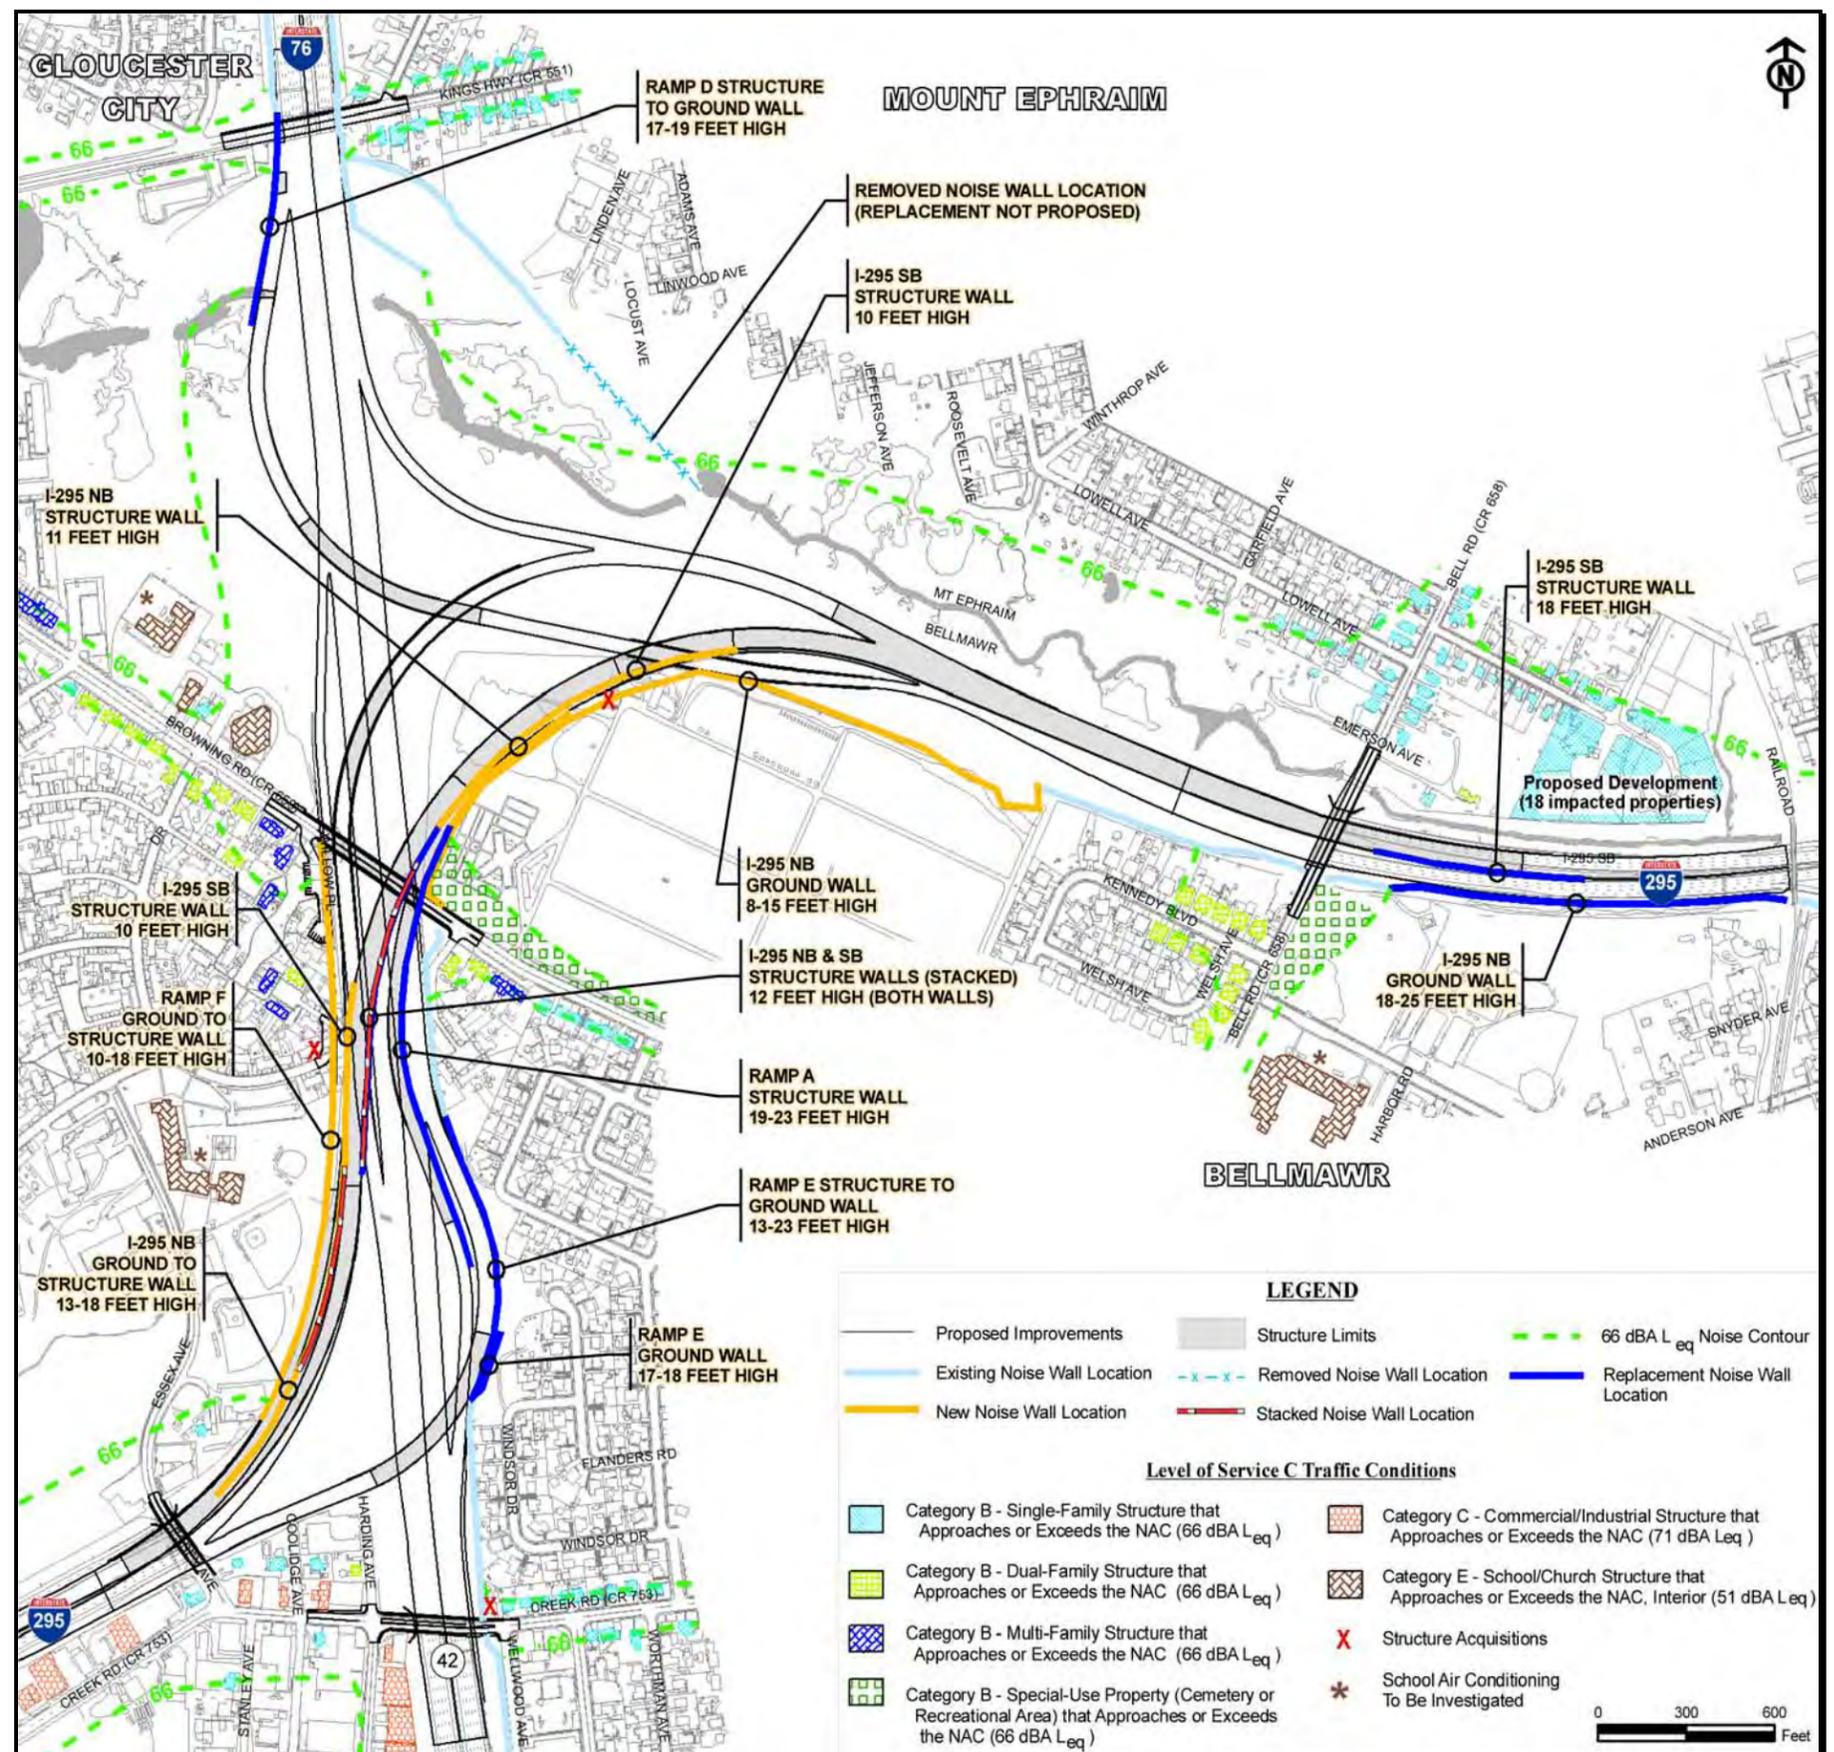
2030 Alternative G2 Proposed Noise Walls
